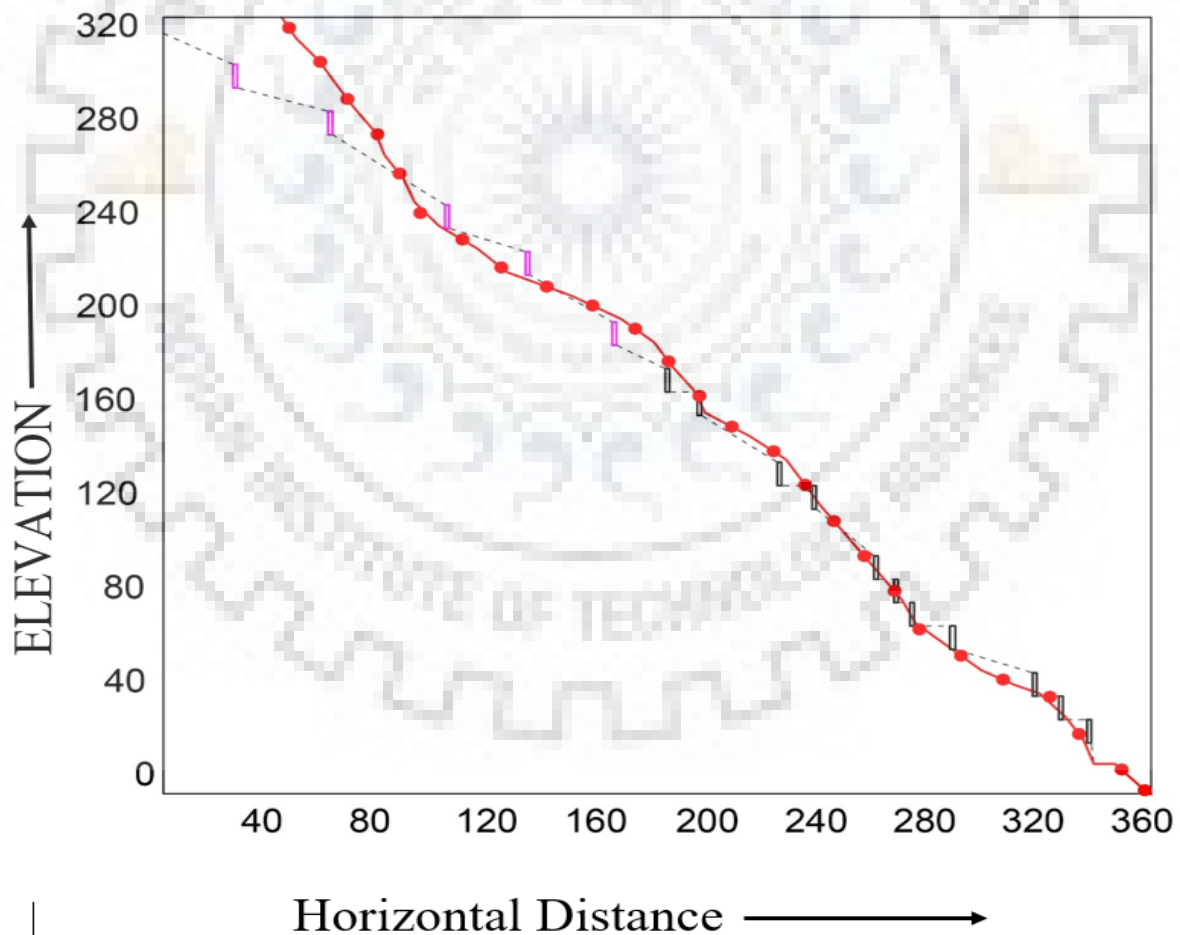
Cross section of retaining earth wall 10 meters proposed at landslide affected area
